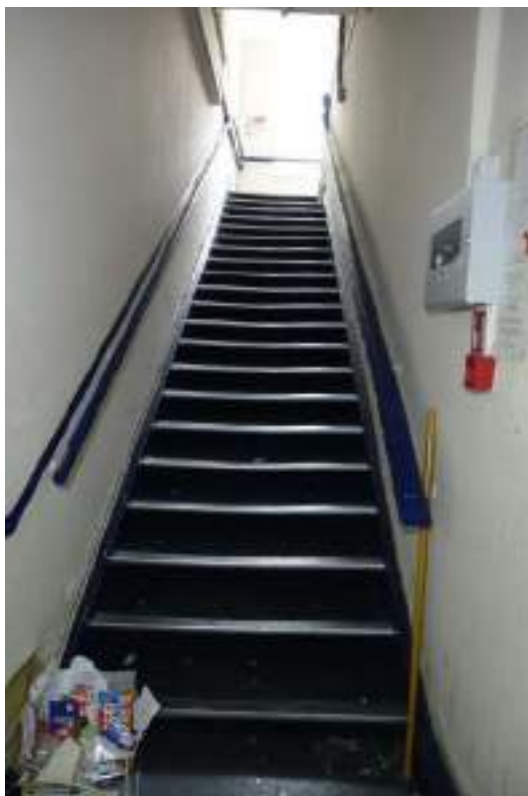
View looking N up the first flight of the main (central) staircase (GF to FF).
